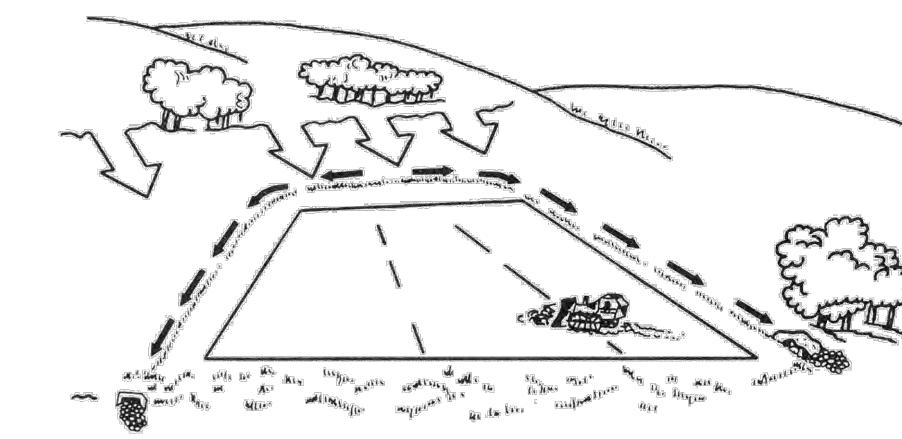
Perimeter dikes prevent surface runoff from entering construction sites.
